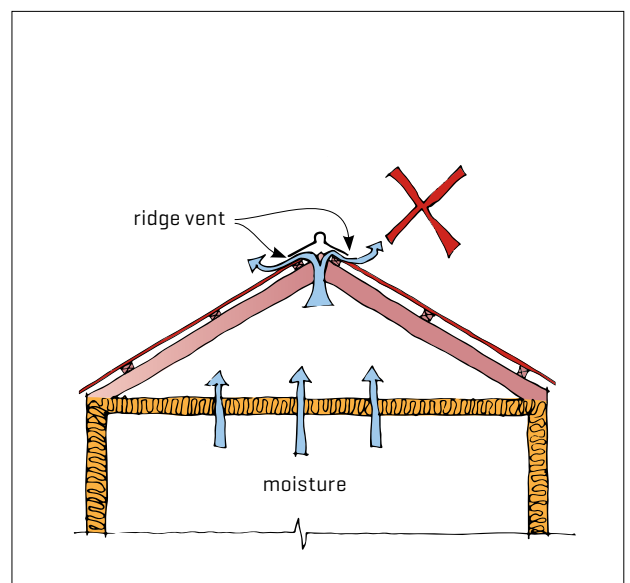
Installing only a ridge vent with no eaves vents increases the potential for moisture to be drawn into the roof space.
